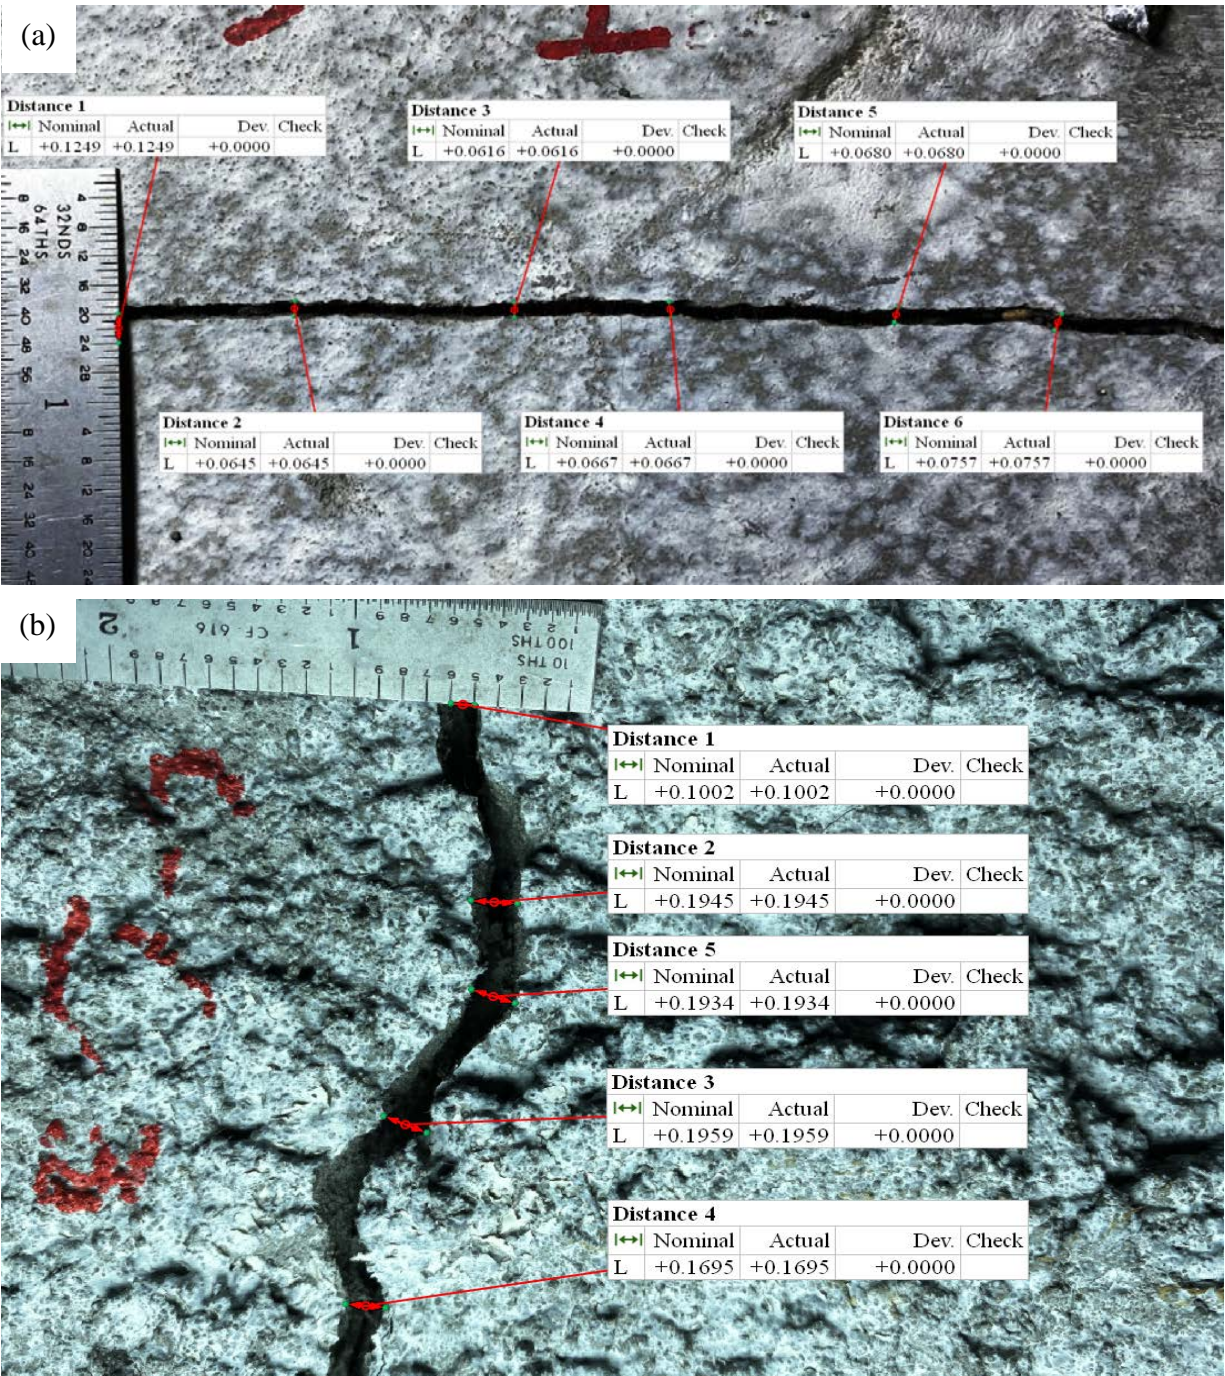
Widened longitudinal shrinkage cracks due to load for 3-in. thick SAPL renewed pipe arch CMP at: (a) invert, and (b) crown locations.
